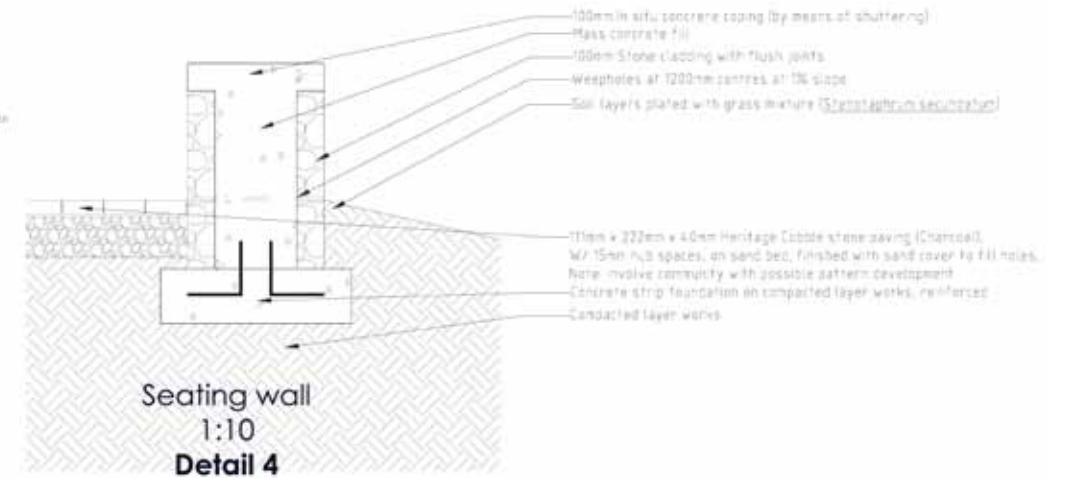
SEATING WALL (not to scale) (AUTHOR, 2011)
